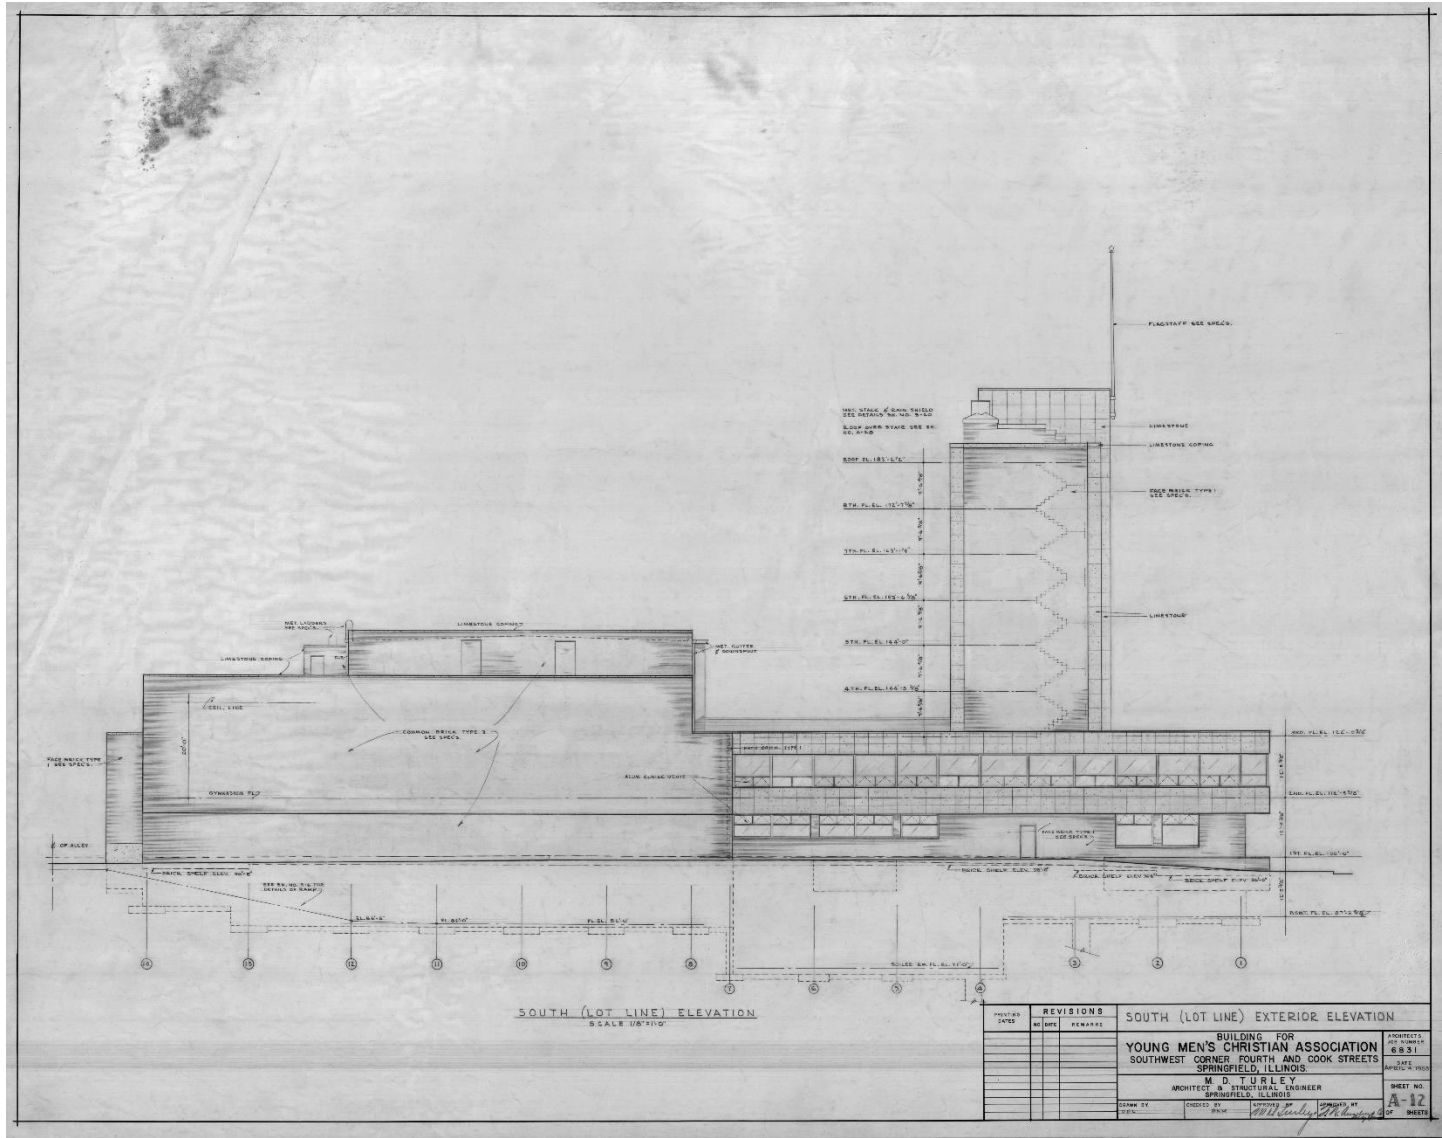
South (Lot Line) Exterior Elevaton (Turley 1958; Sheet No. A-12).
